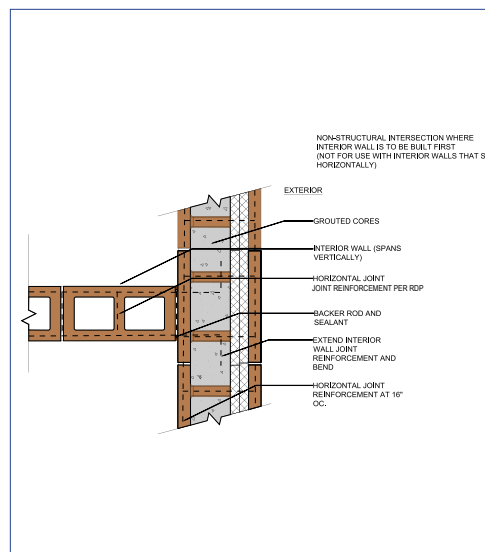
12" HI-R "T" Intersection non-structural option 1
